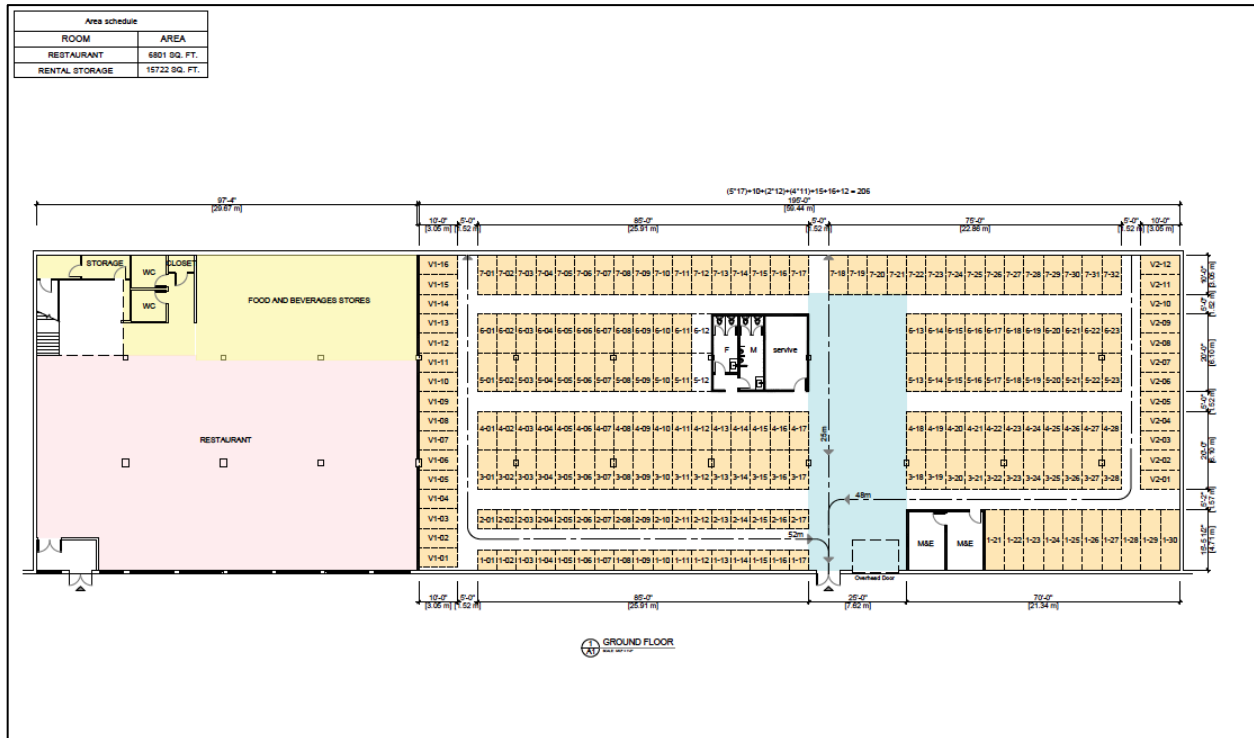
Mini Self-Storage Facility Floor Plan at 484 Hazeldean Road
